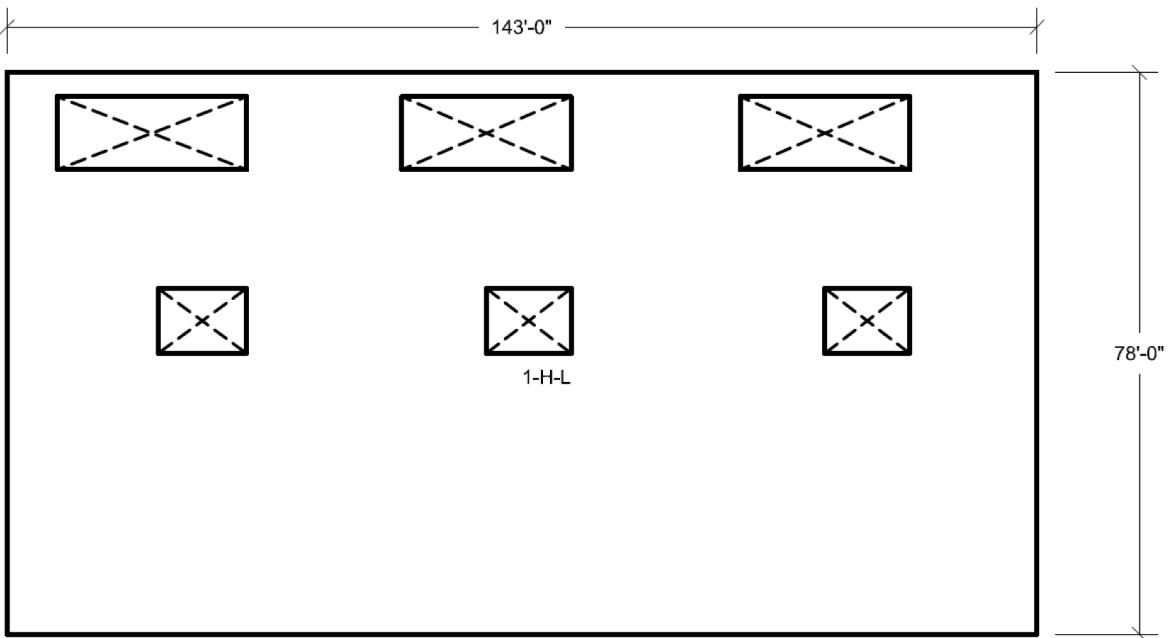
H.6-136B Pump House Roof East/West Reinforcement Zones Bottom Face
